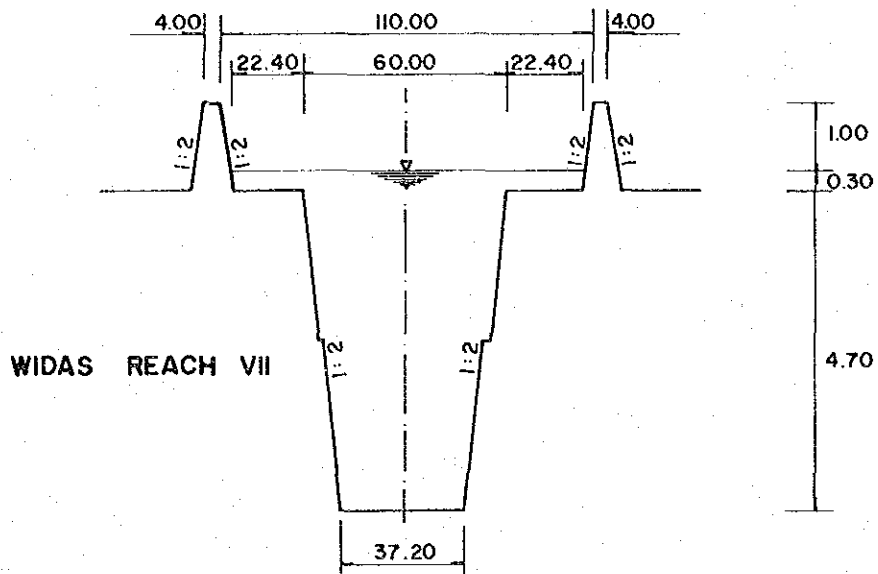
TYPICAL RIVER CROSS-SECTIONS FOR FIRST STAGE PLAN (3/6)
